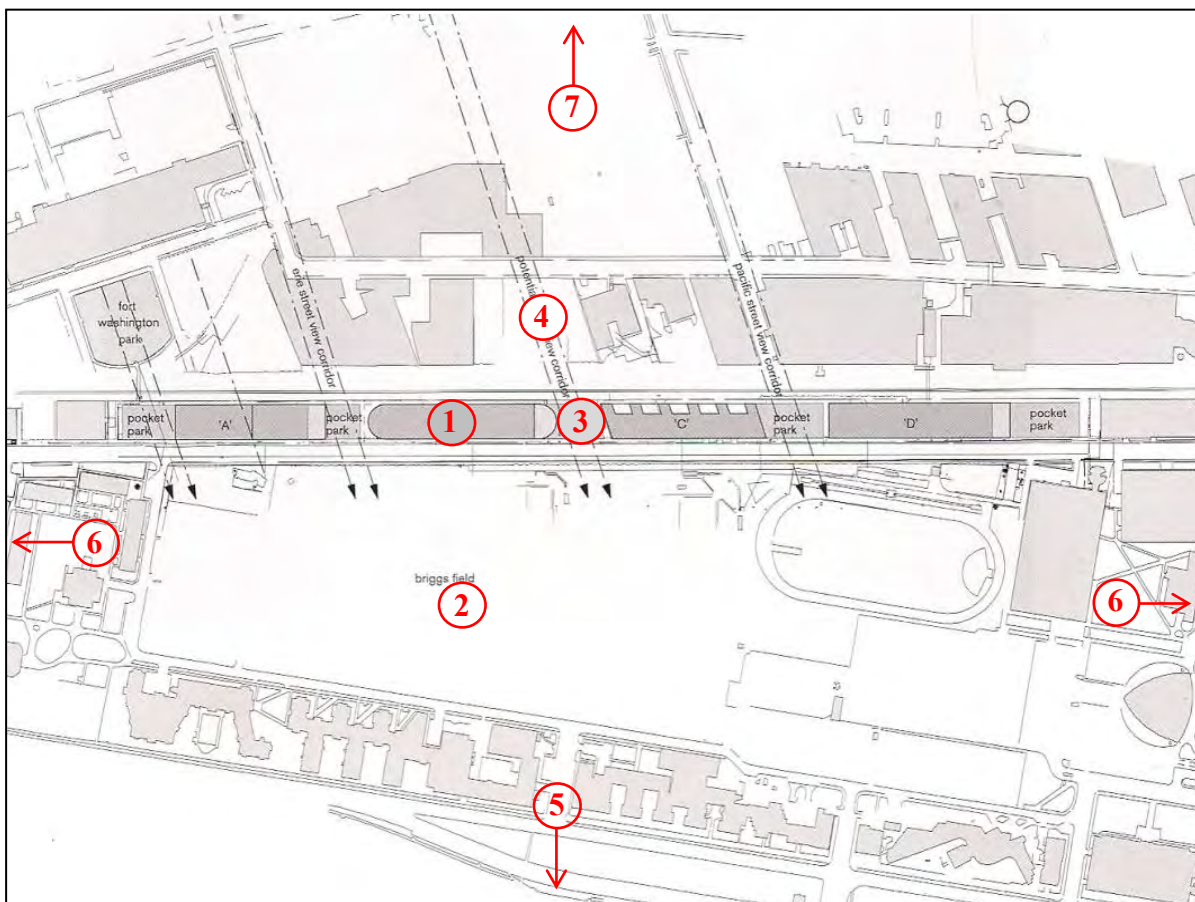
(Source: Frampton, 2003) : Site Plan (NTS).
